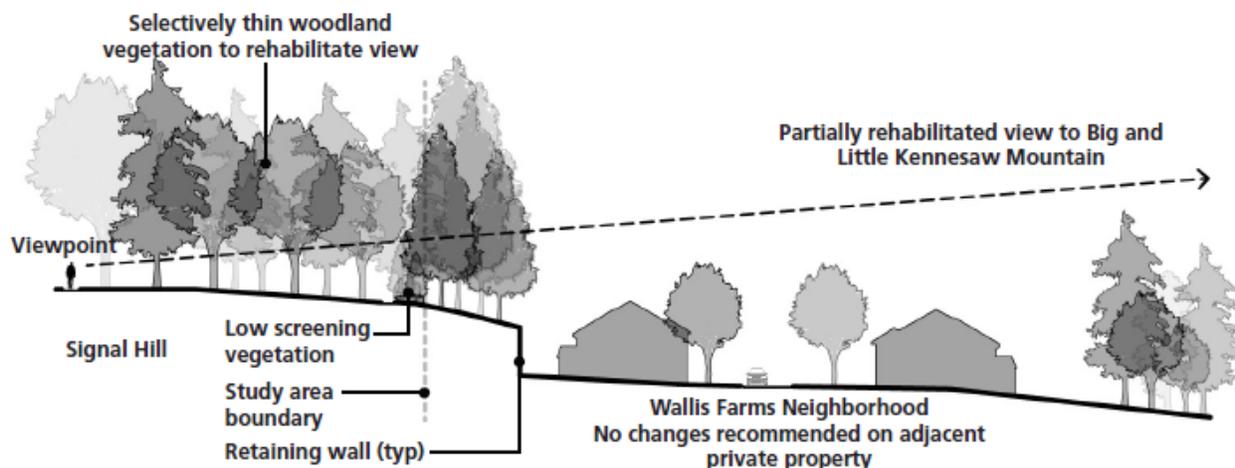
Relative Elevations of the Proposed Viewpoint and Wallis Farm Neighborhood
